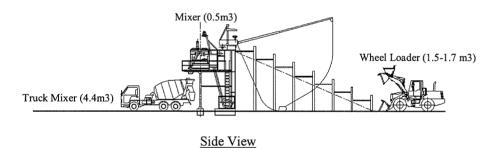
A Portable Concrete Mixing Plant Layout
